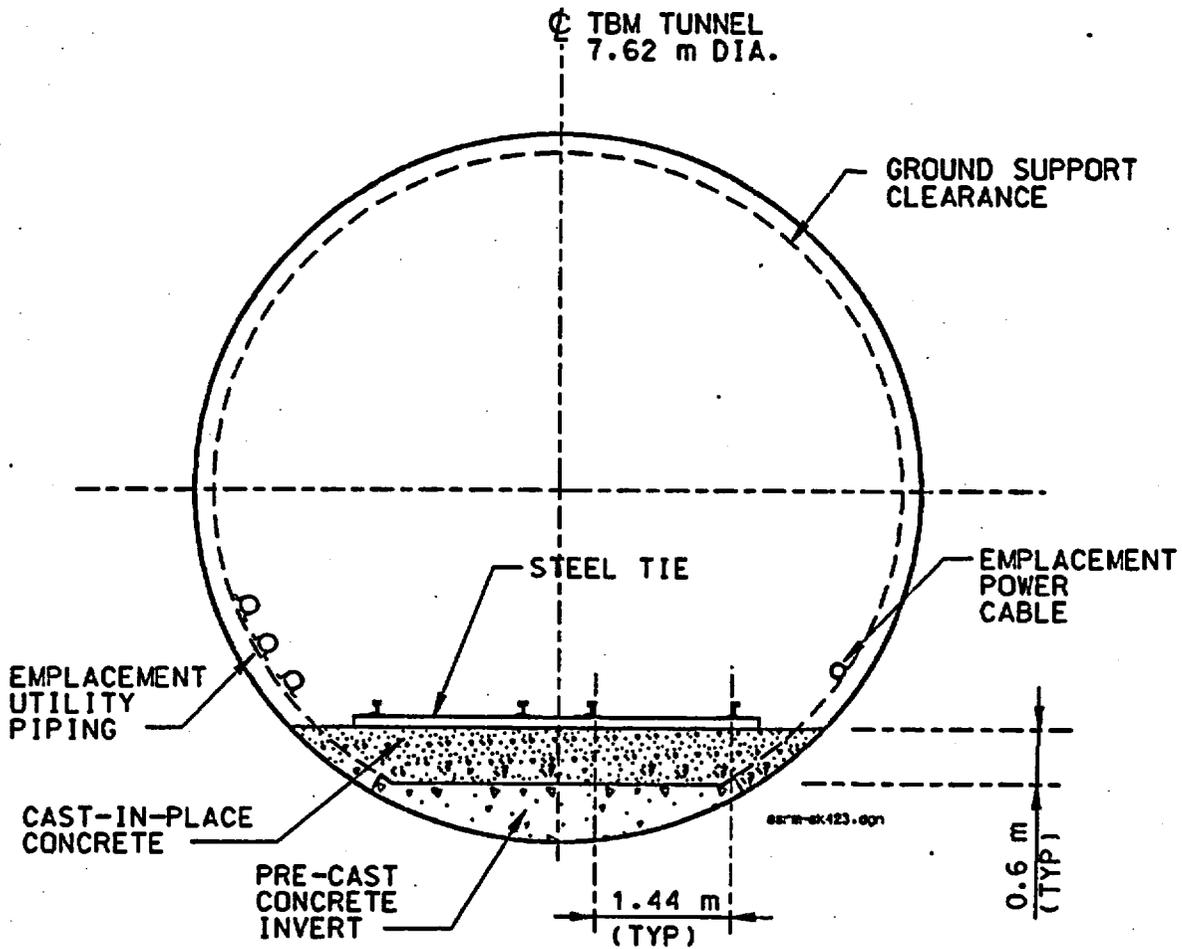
Cross Section of 7.62 m Diameter TBM Tunnel - Construction Phase
